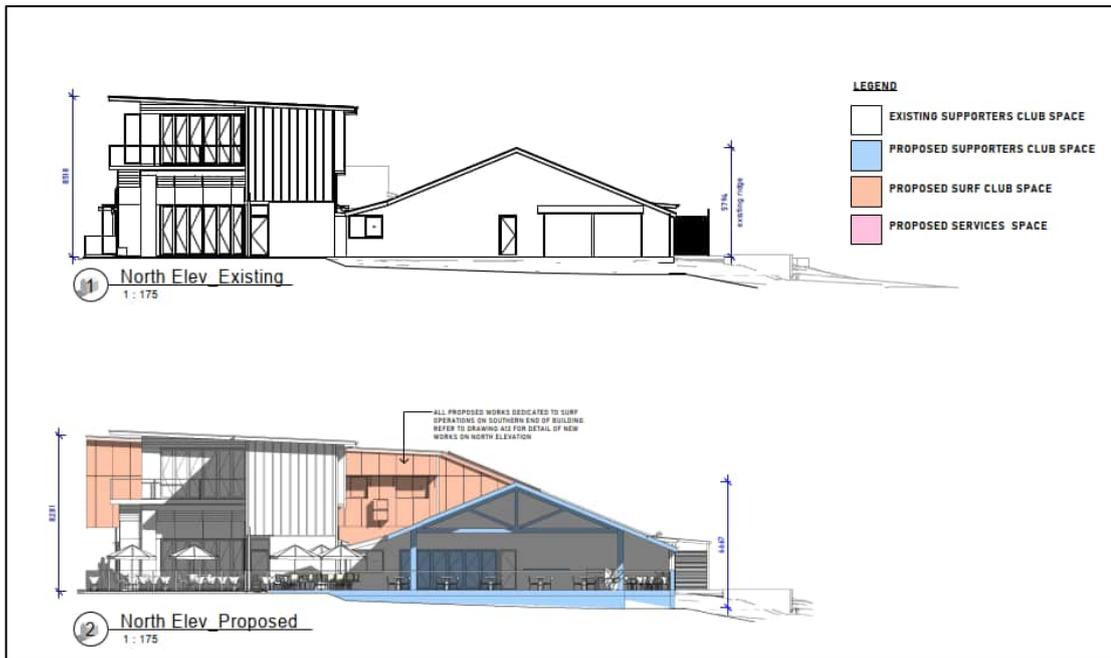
North elevation of existing building and post development scenario (Source: Buderim Design Studio 2024)
